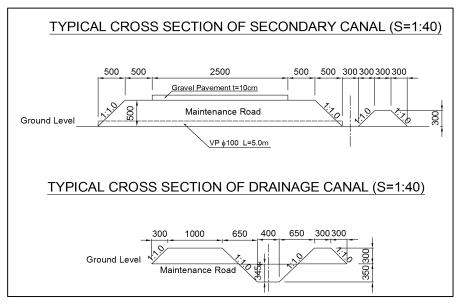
Typical Cross Section of Secondary Canal and Drainage
